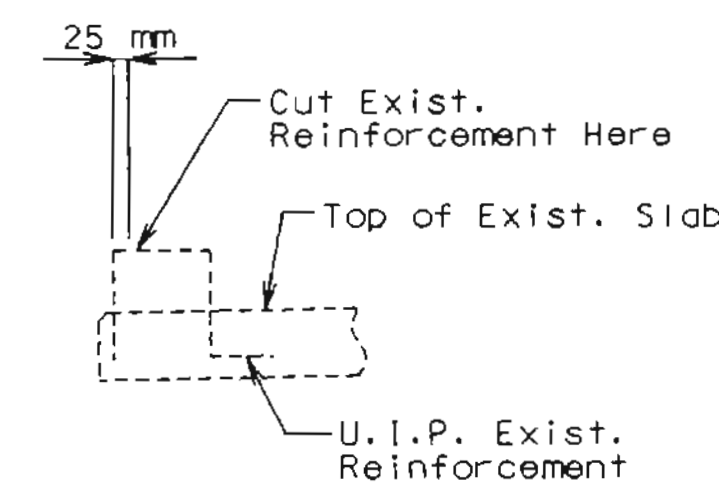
DETAILS OF SLAB DRAINS (LEFT SIDE ONLY)
